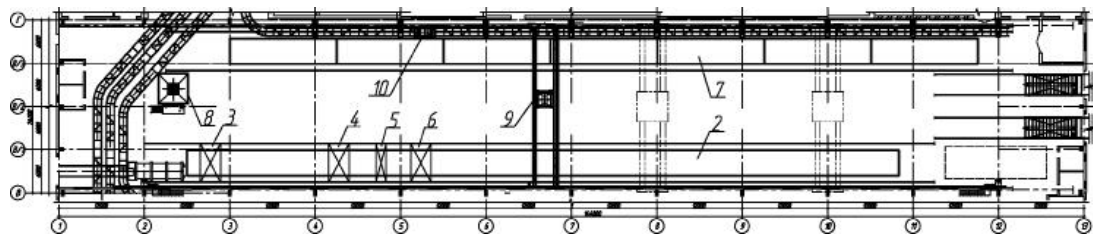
Forming a plan of span No. 1 (3rd launch complex): 1 – conveyor production line of external wall panels; 2, 7 – stand for the production of external wall panels; 3 – machine for cleaning and lubrication of the stand; 4 – trowel machine; 5 – vibrator; 6 – machine for laying insulating tarpaulin; 8 – post washing concrete paver; 9 – bridge concrete paver; 10 – Kubel targeted concrete supply
